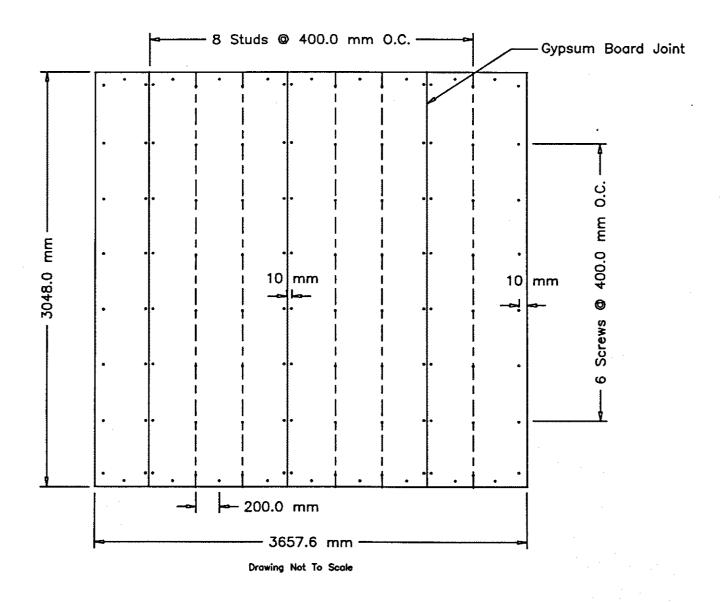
Screw Locations For Wood Stud, 2x2 Gypsum Board Layers, Full-Scale Assembly, Face Layer Gypsum Board, Fire Exposed Face
